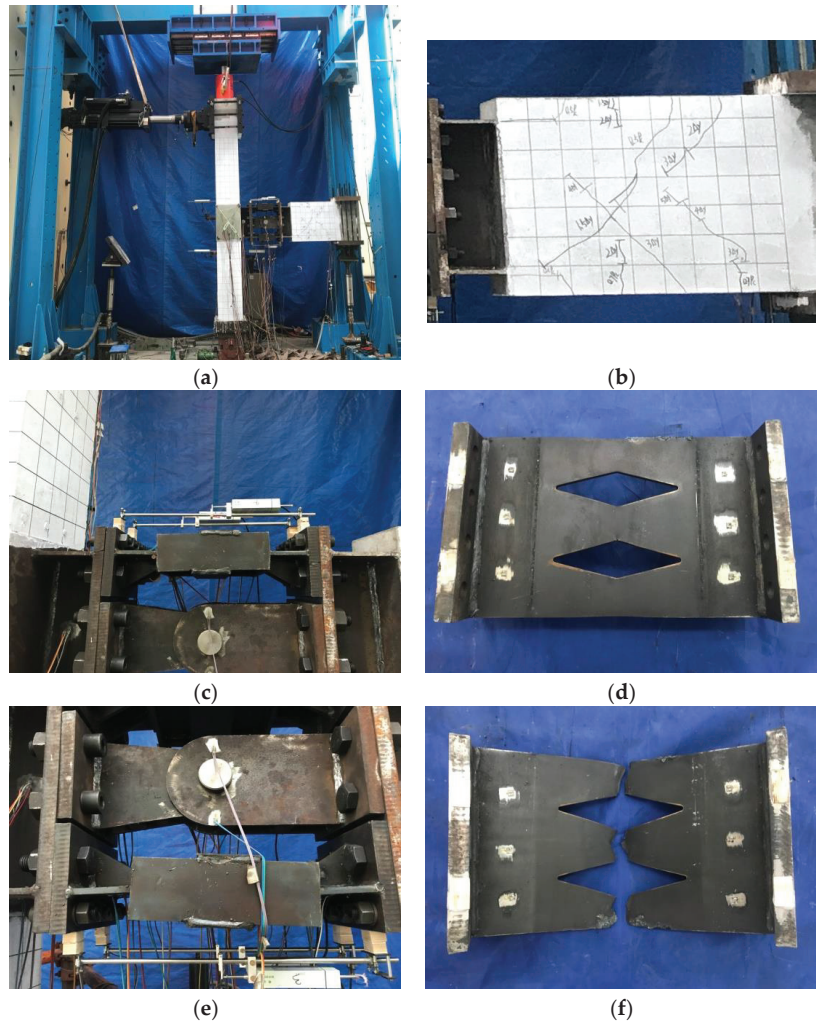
(a) The failure mode of the precast replaceable beam-to-column joint; (b) crack development in concrete; (c) failure mode of the upper connector; (d) failure mode of the upper steel plate; (e) failure mode of the lower connector; (f) failure mode of the lower steel plate.
